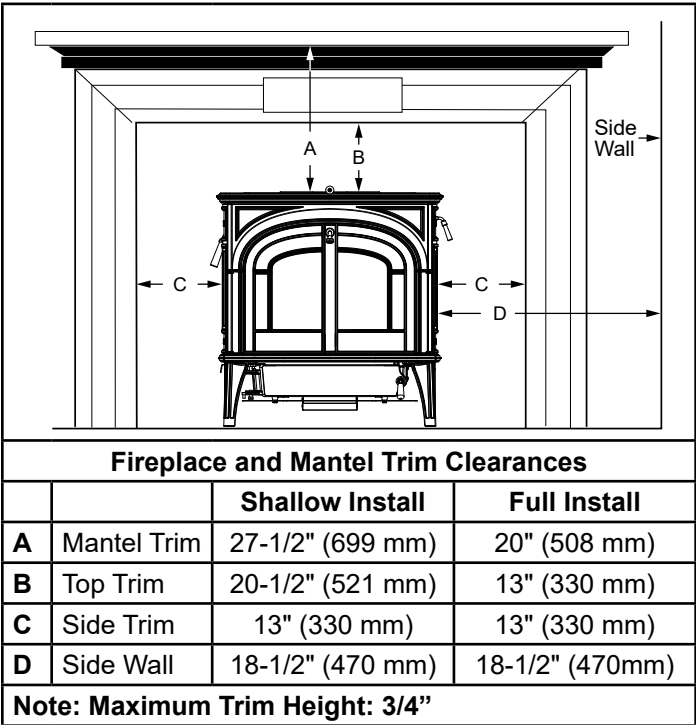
Maintain clearances to combustible components of the mantel piece.
